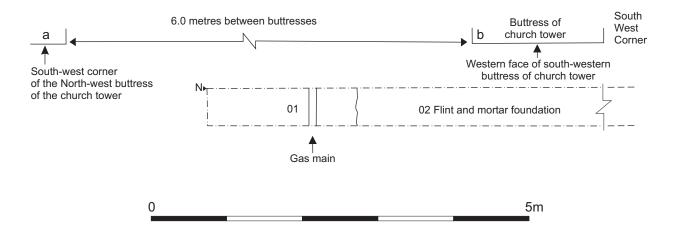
Plan of trench location in relation to the south-west buttress of the west tower of the church.
